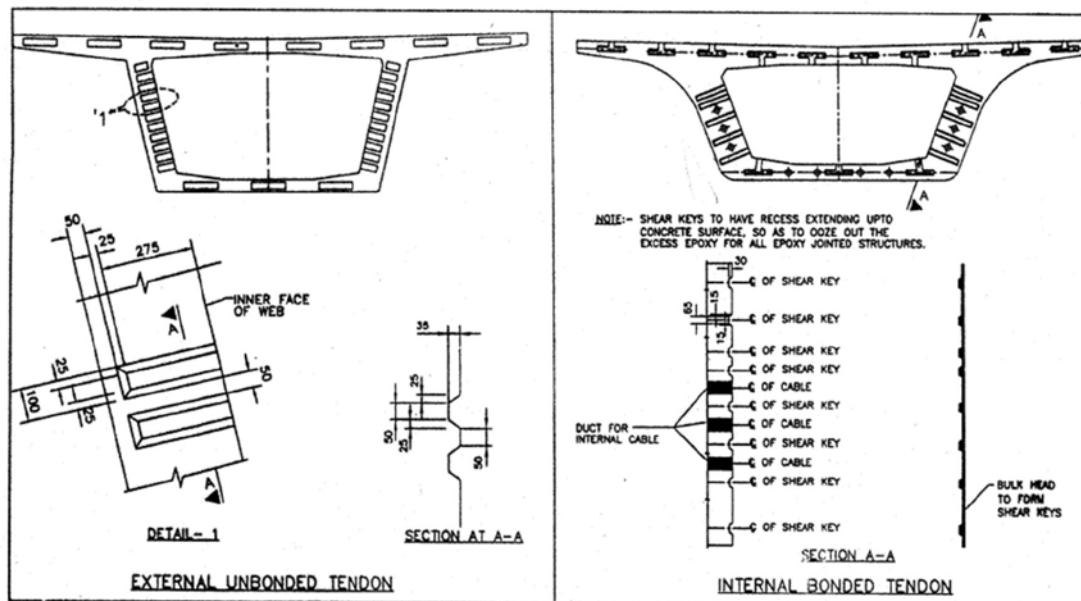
Organisation of Shear Keys in Precast Box Girder Segment
